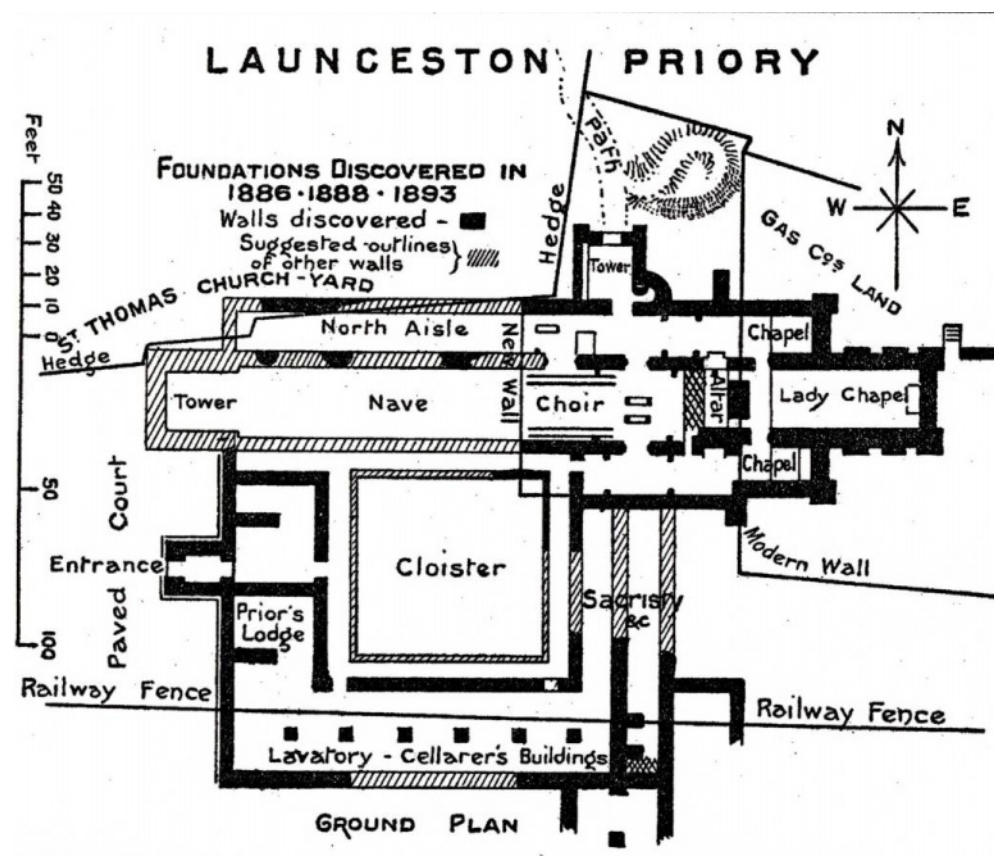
Launceston Priory: Peter's overall site plan of 1893 (Peter 1893b)
